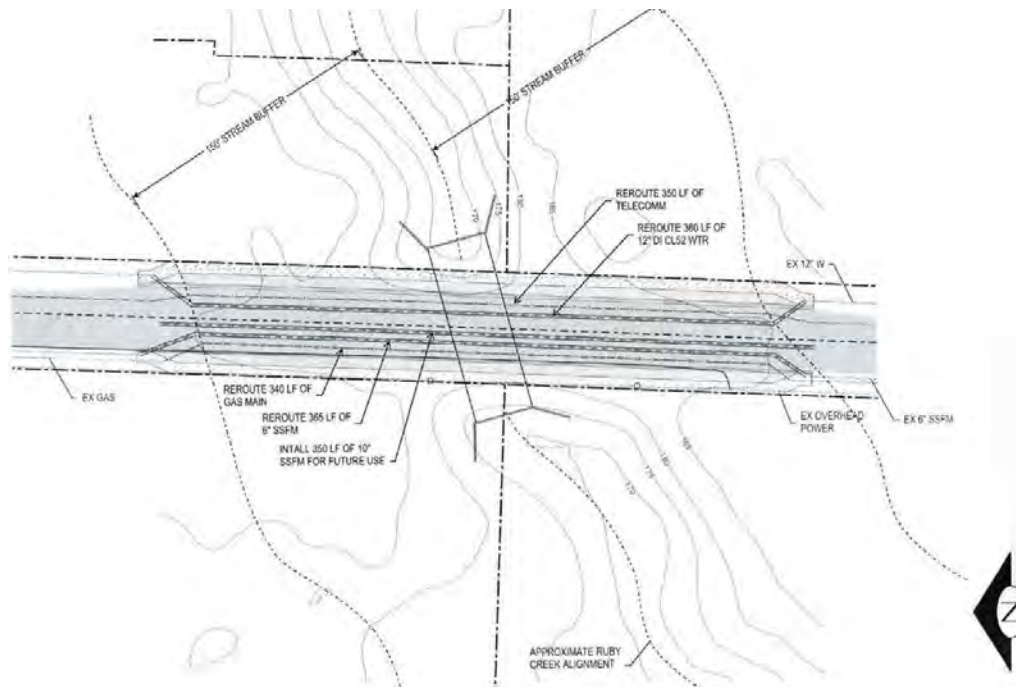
The City has developed preliminary culvert replacement plans for the Ruby Creek culvert under Sidney Road SW and is seeking grant funding for this project.
